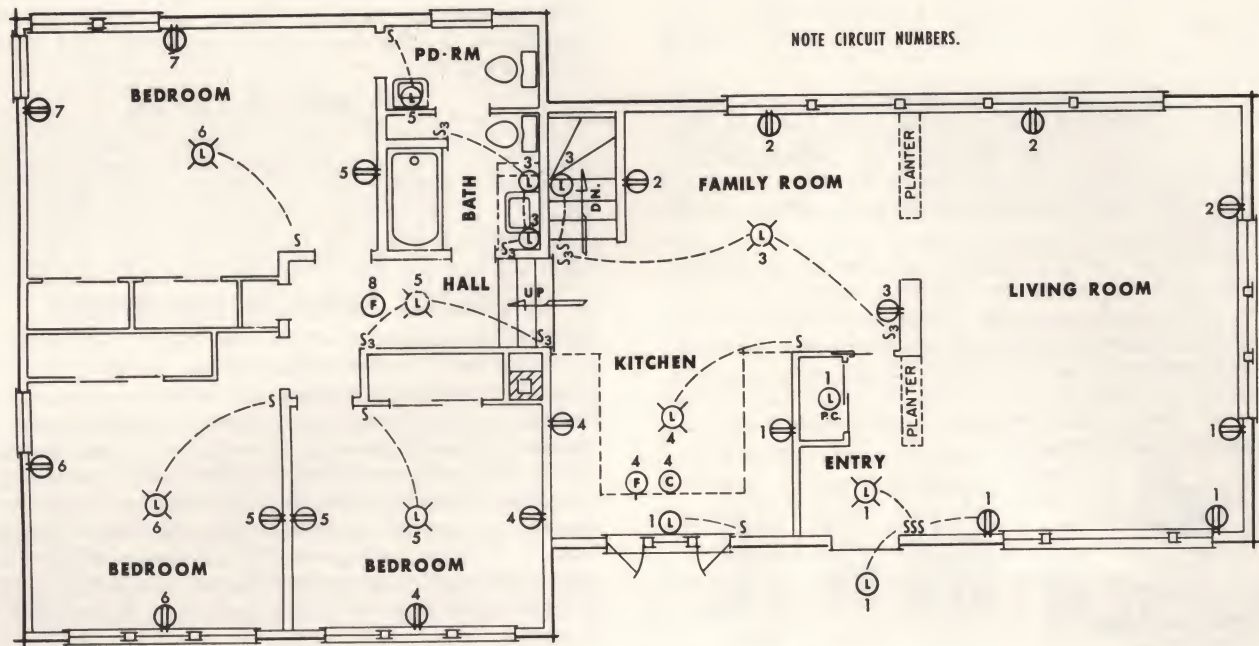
WIRING LAYOUT PLAN VIEW OF 3rd and 4th LEVELS.
